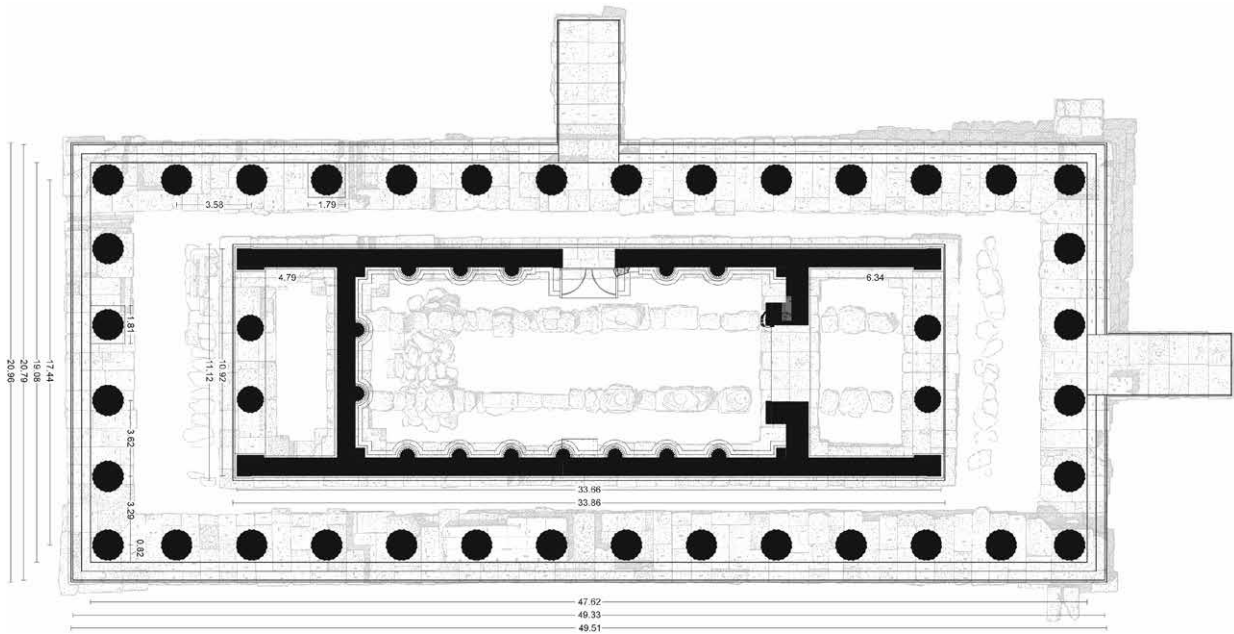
Reconstructed plan of the temple of Athena Alea superimposed on the foundations (J. Pakkanen).
